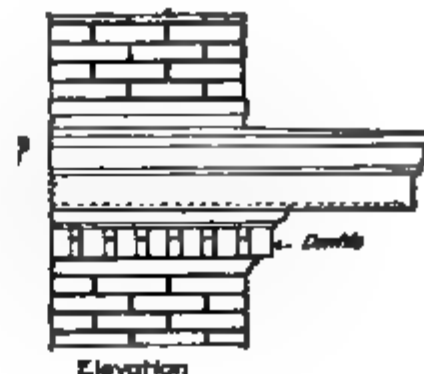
Detail of wood cornice on brick wall. (Cornice on Independence Hall, Philadelphia, Pa.)
